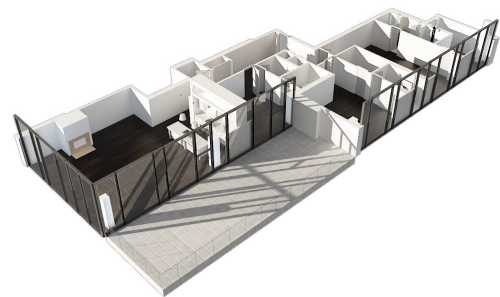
Upper Floor Unit layout with outdoor terrace (6th – 12th floors)
